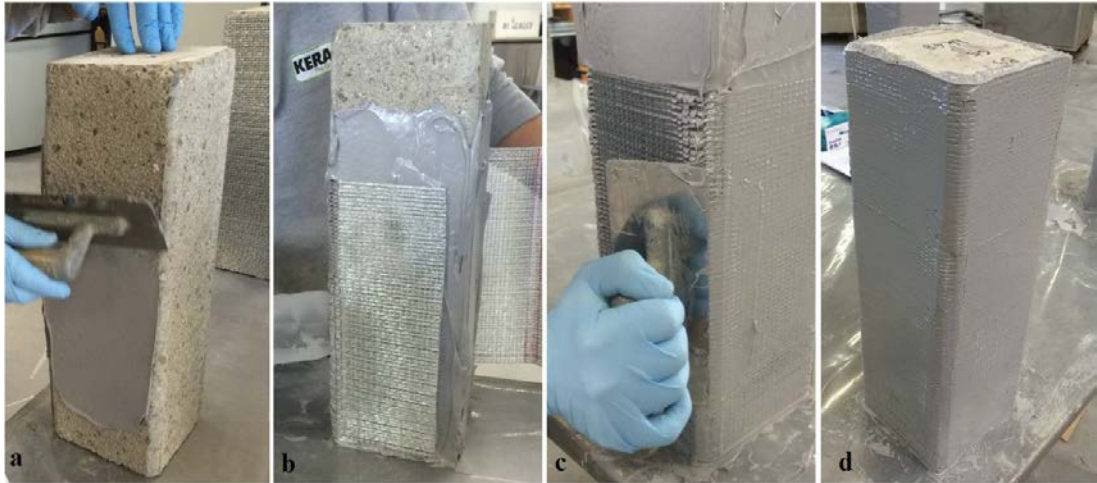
Specimen preparation: (a) application of matrix to concrete surface; (b) application of steel fiber sheet around the prism; (c) application of external layer of matrix; (d) finished specimen.
